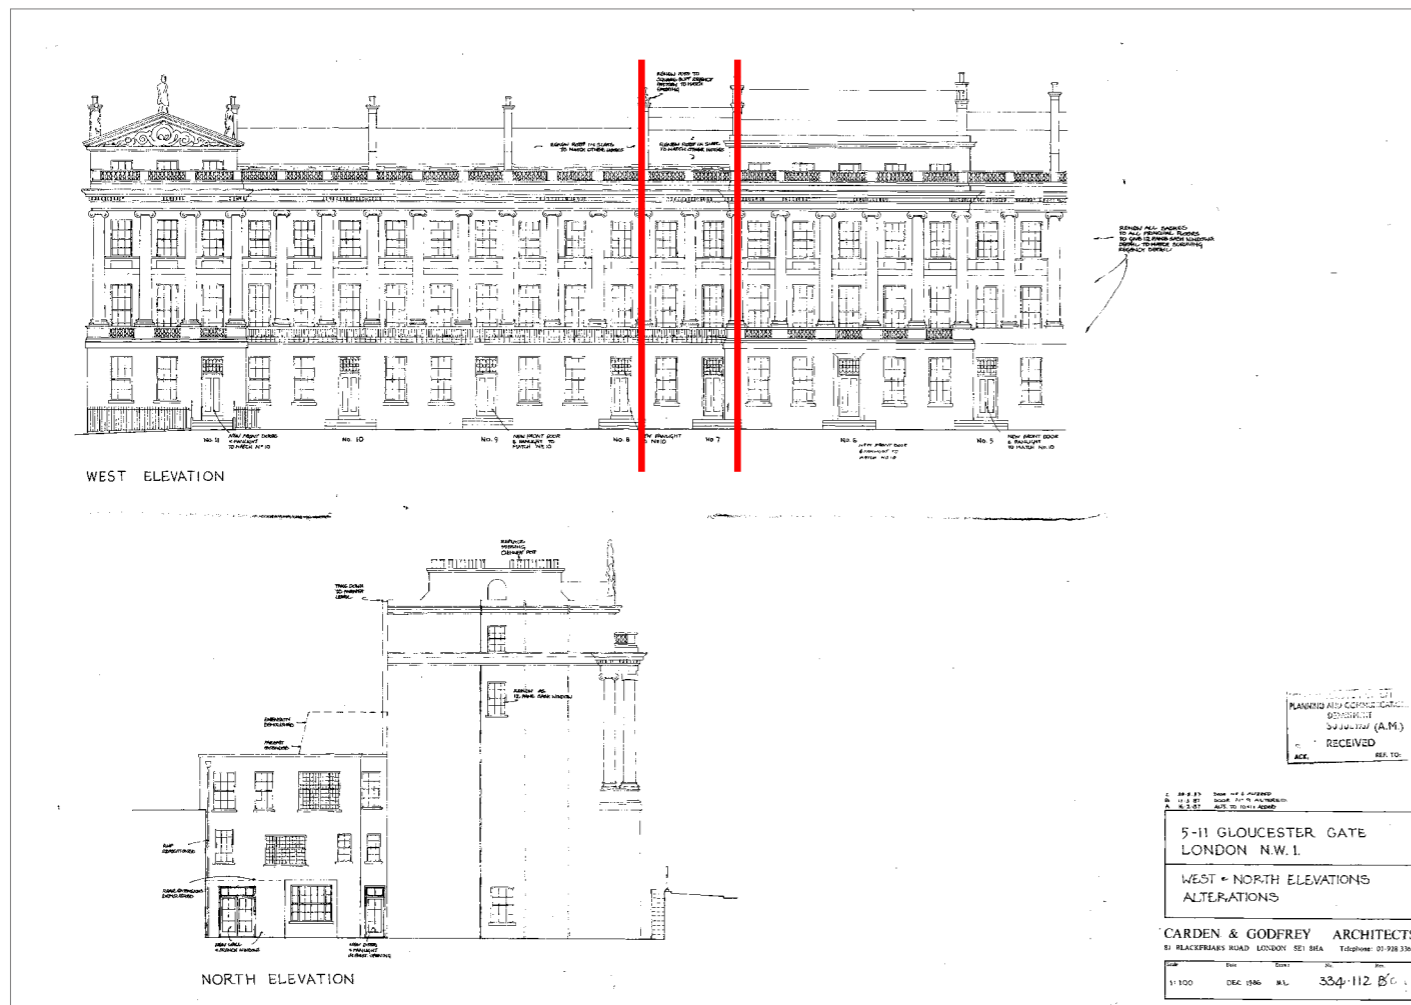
Consented plans for principal elevation at 8 Gloucester Gate, 1987.
